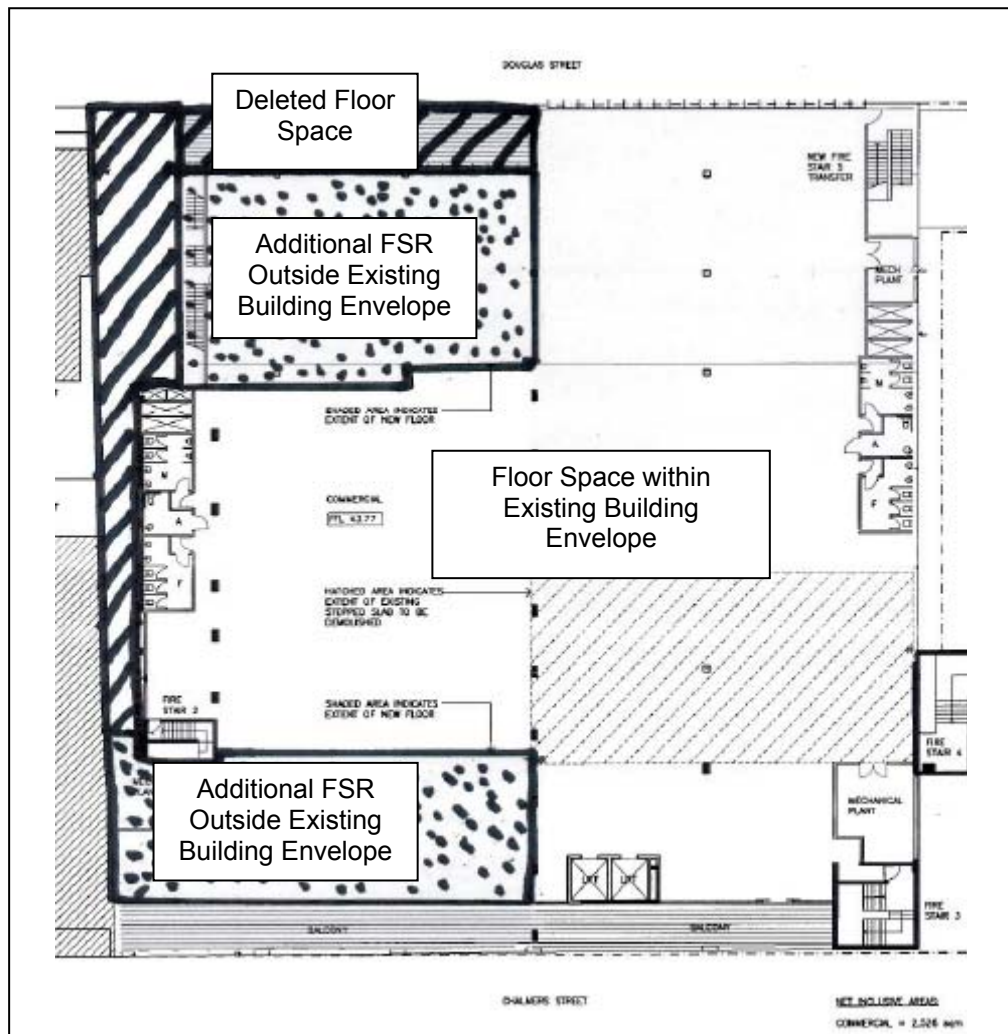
Level 3 Floor Plan Showing Location of New Floor Space & Areas Where Additional Floor Space has been Deleted from Proposal
